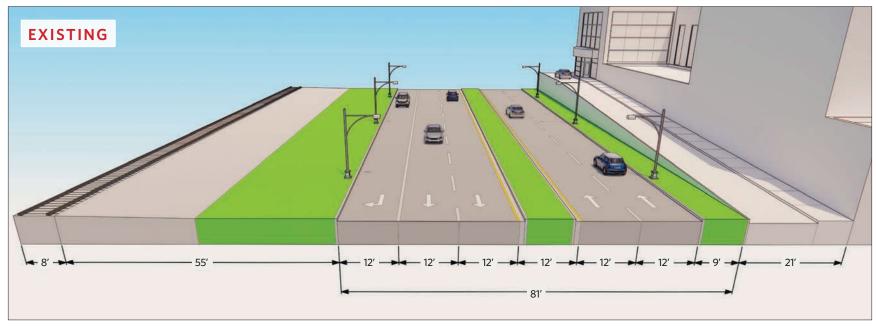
Existing Street Section for Southwest Stadium Drive, Looking Northeast
